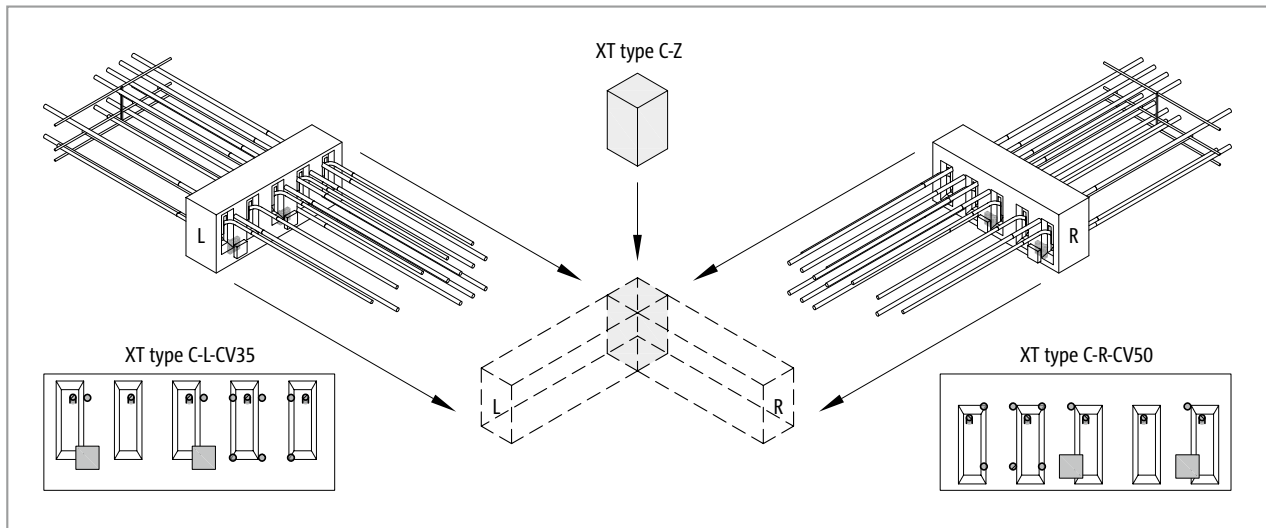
Schöck Isokorb® XT type C-L-CV35, XT type C-R-CV50: Arrangement at the corner using corner insulating element
